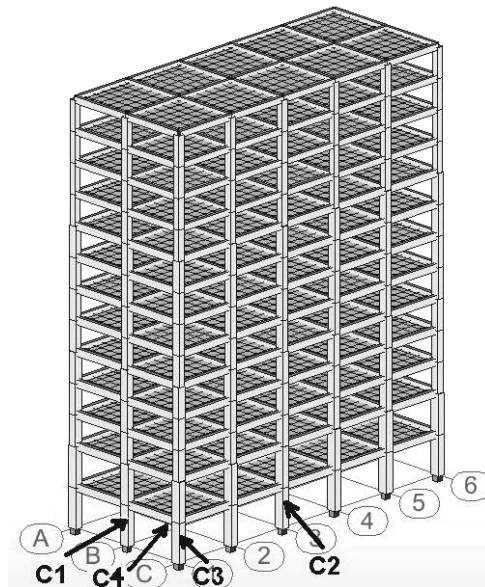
Model of a 13-story RC building: missing column scenarios [13]
